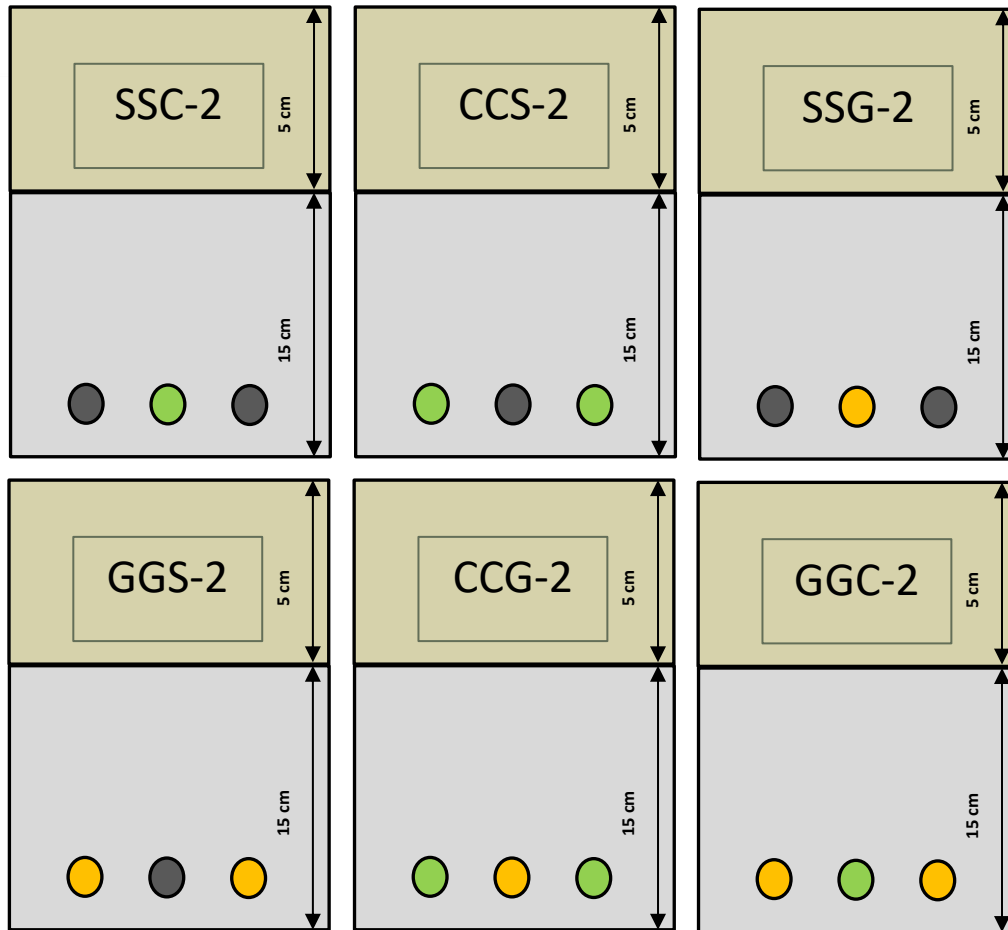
Details of Bilayer Concrete with Different Rebars Specimens.
